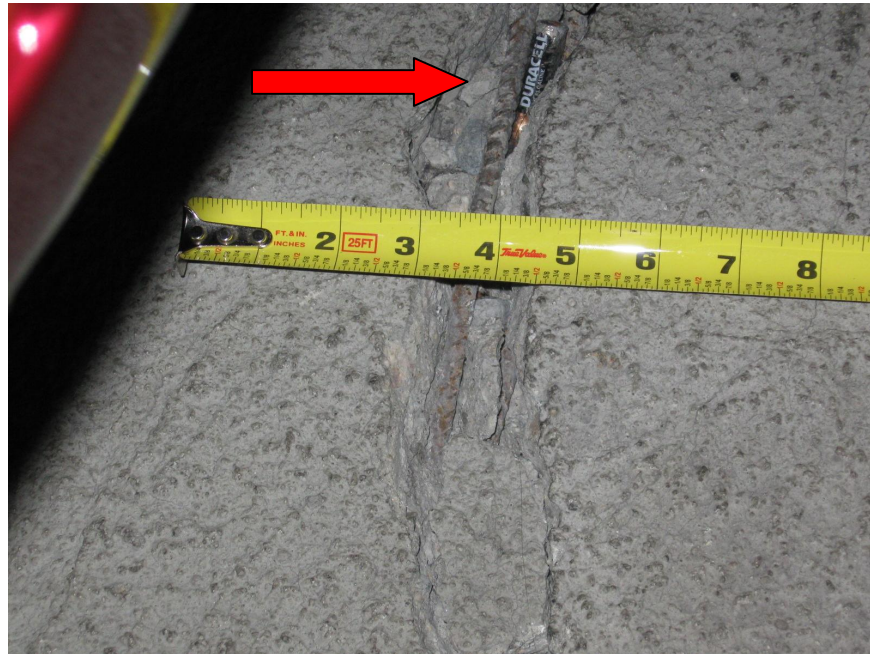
Close-up of cracking along column line 5; arrow denotes spalling
